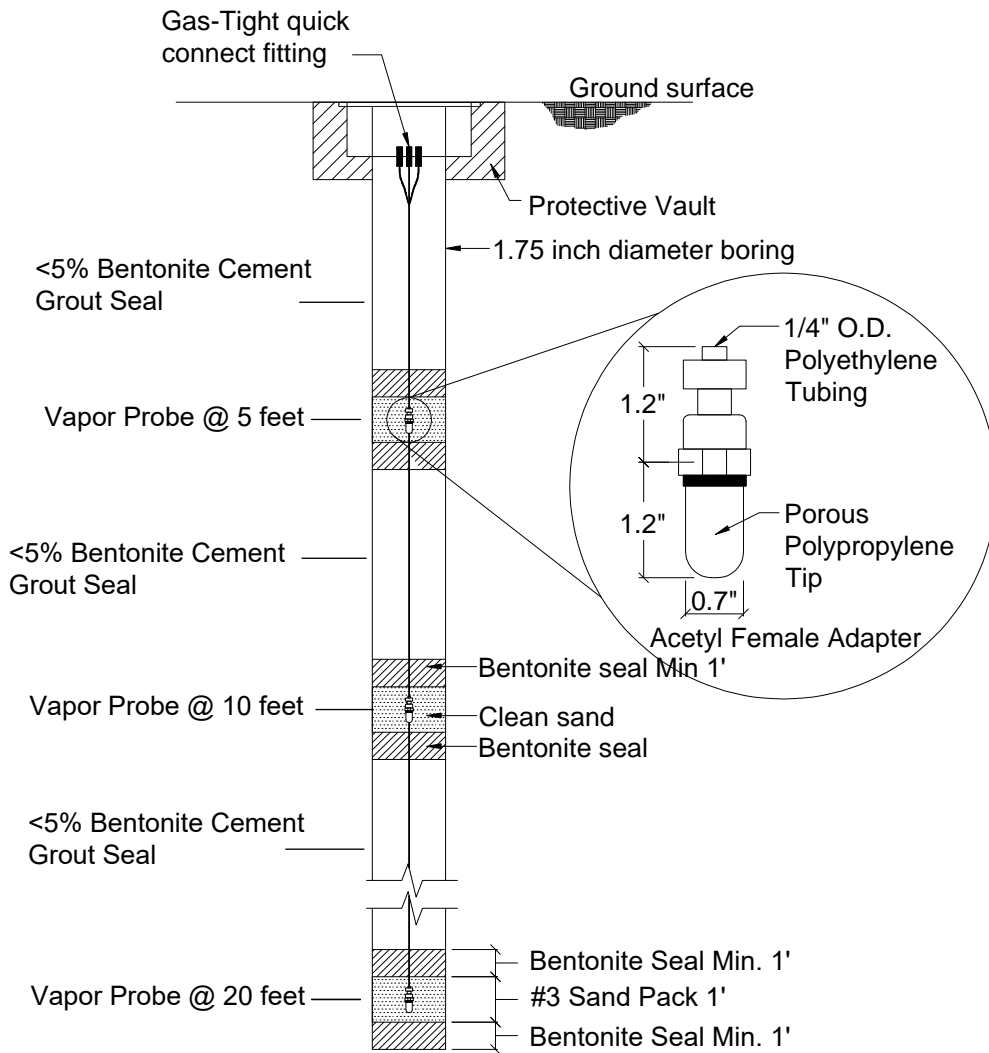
Vacant Building 3377 West Olympic Boulevard Los Angeles, CA 90019	Drawing
